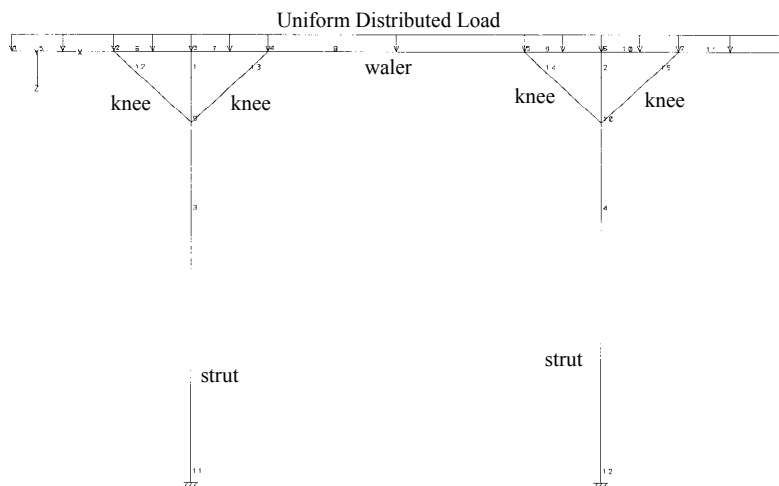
Typical structural frame configuration with UDL load on the waler of a strutting system
